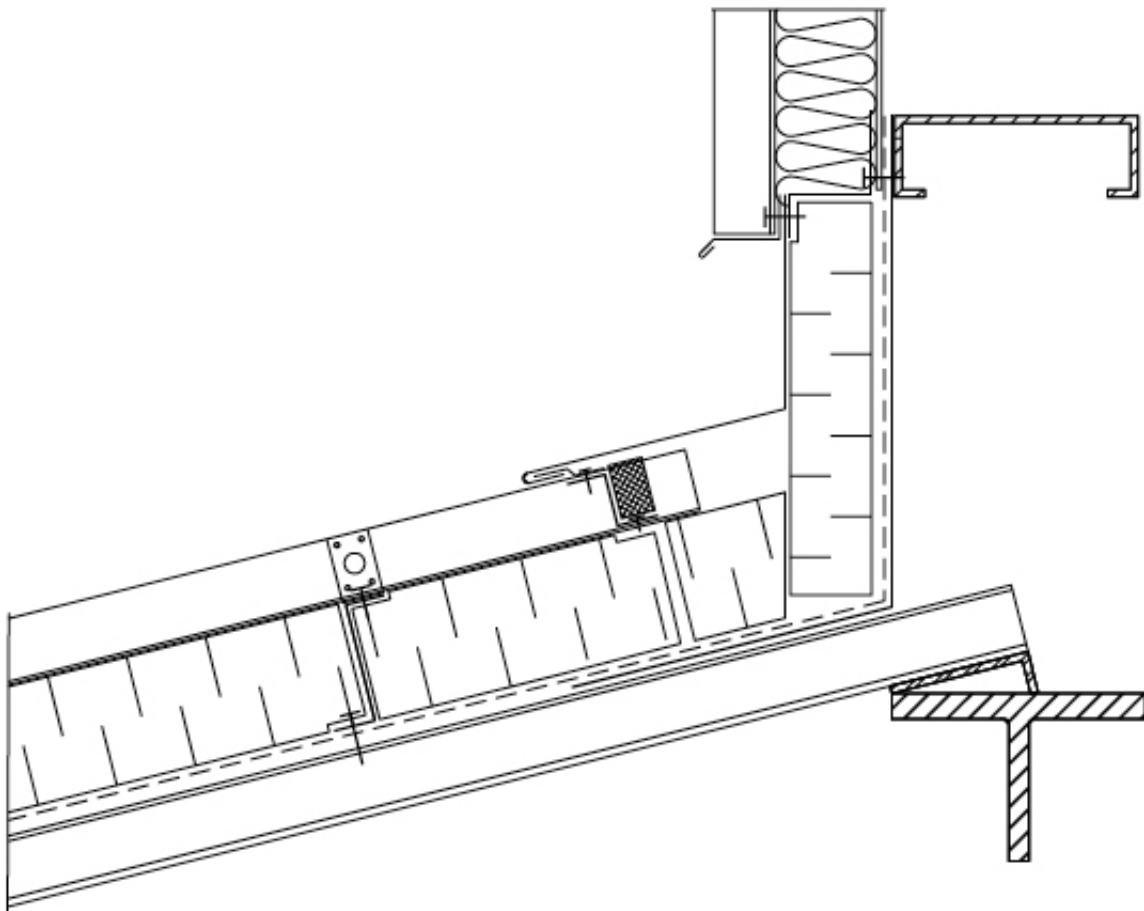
A: Roof to Wall Perpendicular to Sheet - Insulated Sheet Steel WallInstallation/Assembly Notes:
